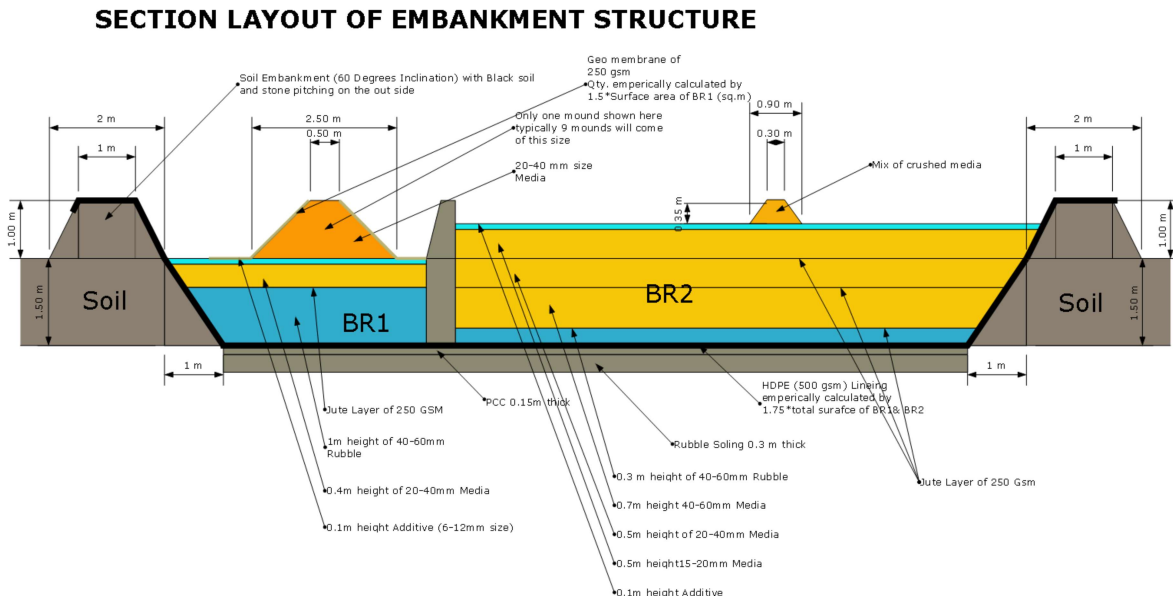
b: Layout of CAMUS-SBT Media in Soil embankment containment
